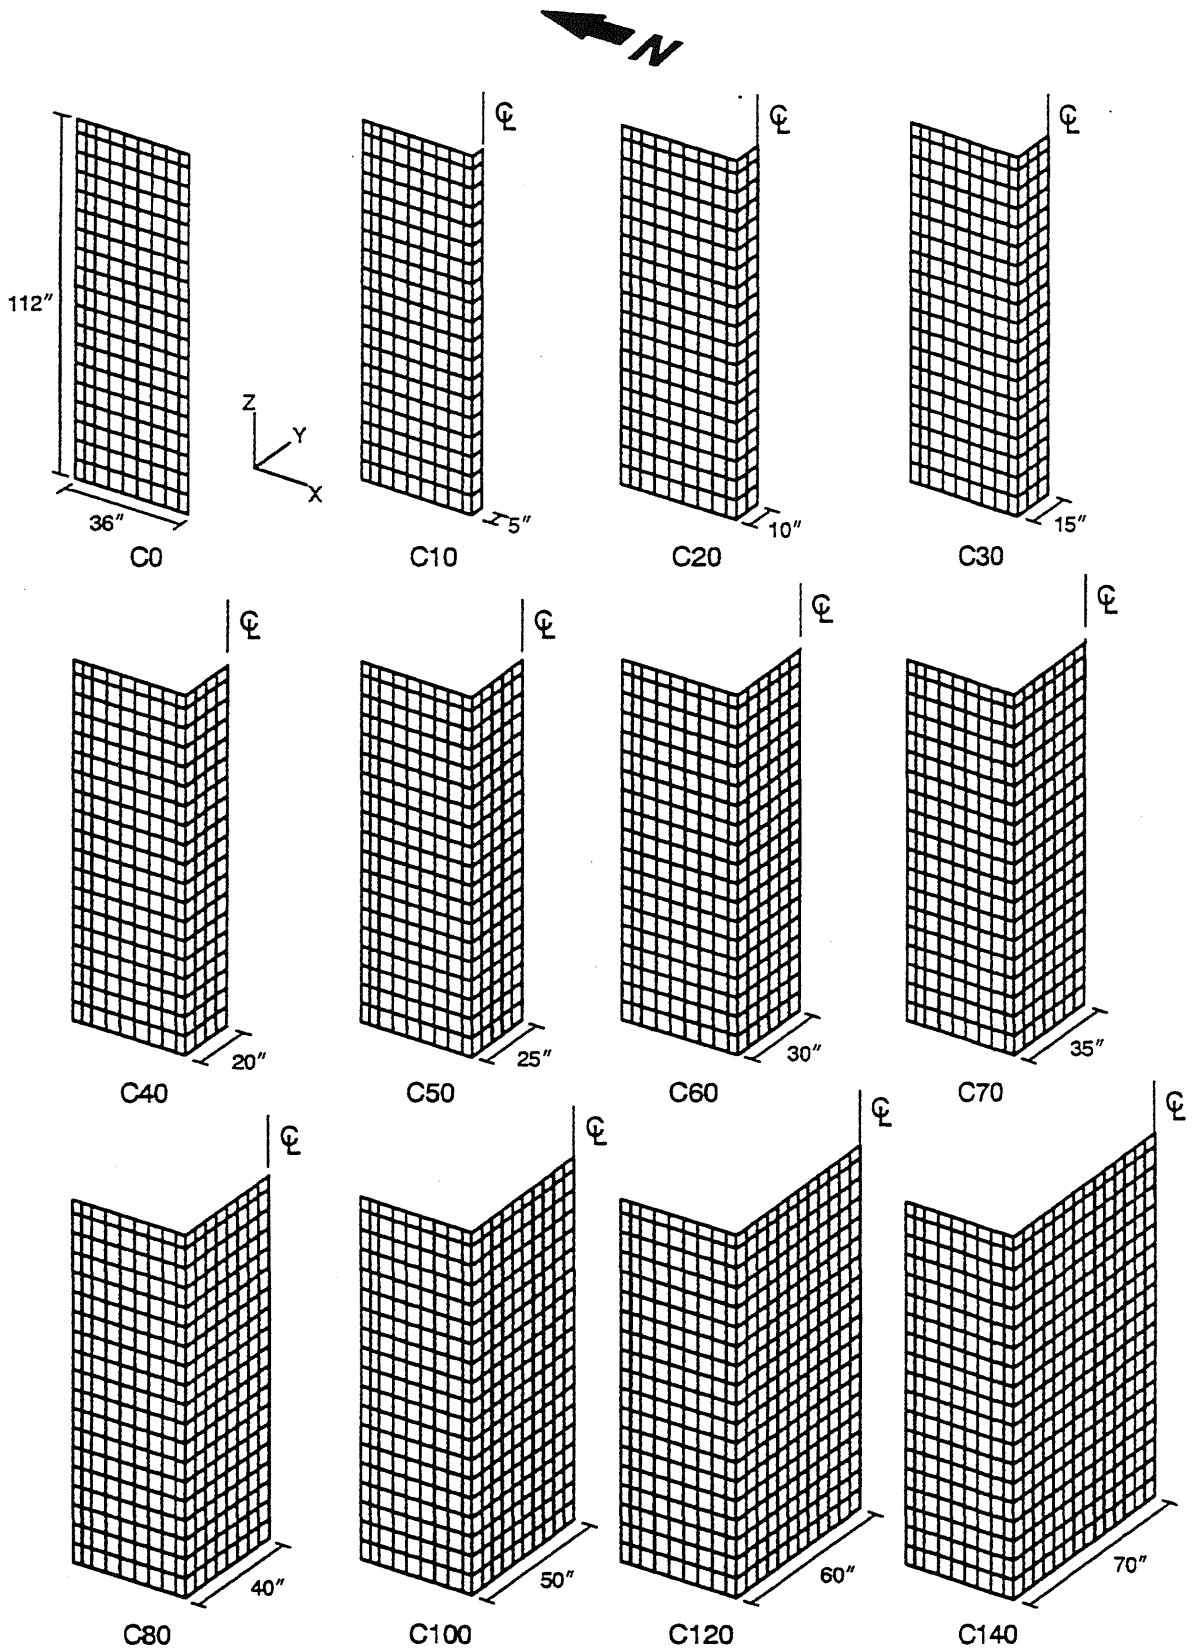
Finite Element Meshes for C-Shaped Wall Models
